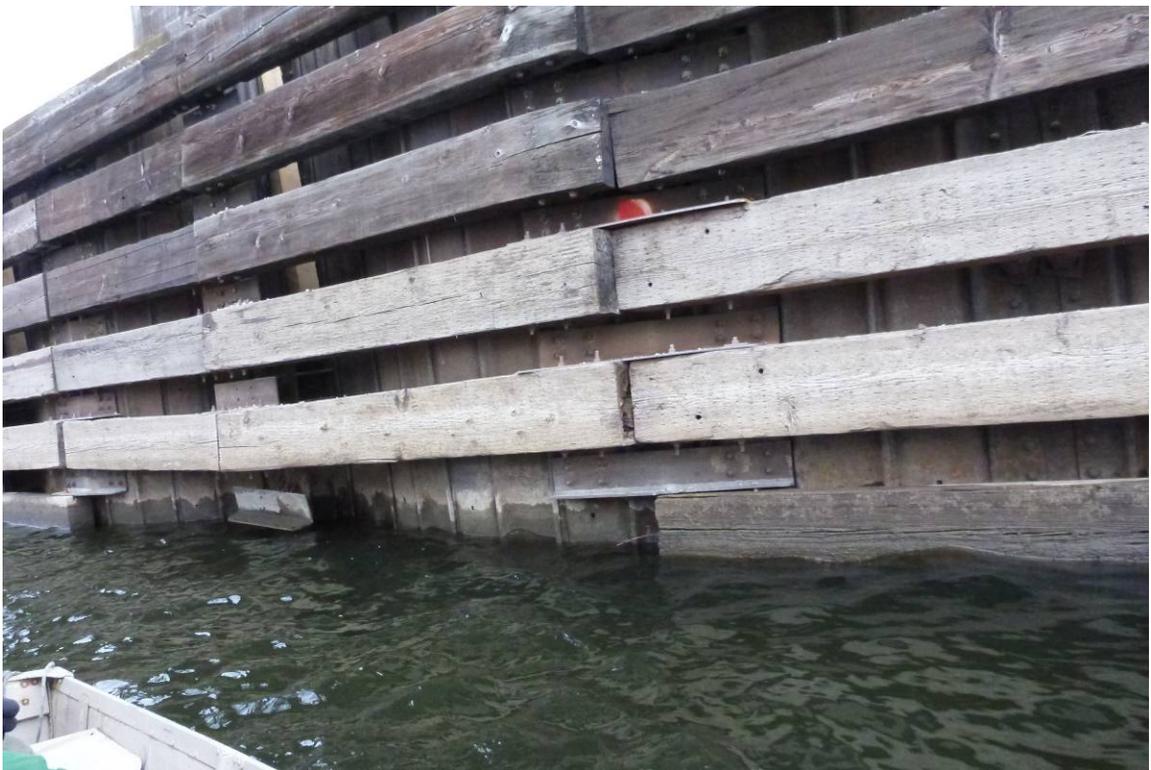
View of Upstream End of Pier 4, Looking Southwest.
